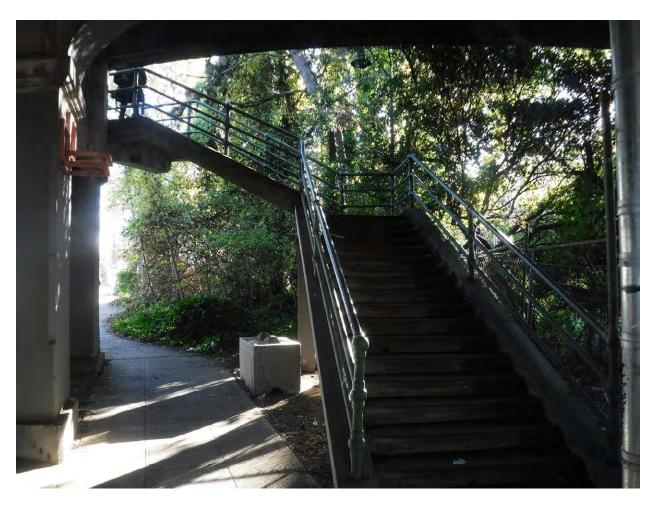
North approach, east stairway looking east from sidewalk on south side of NE 40th Street beneath the bridge deck (HDR 2023).
